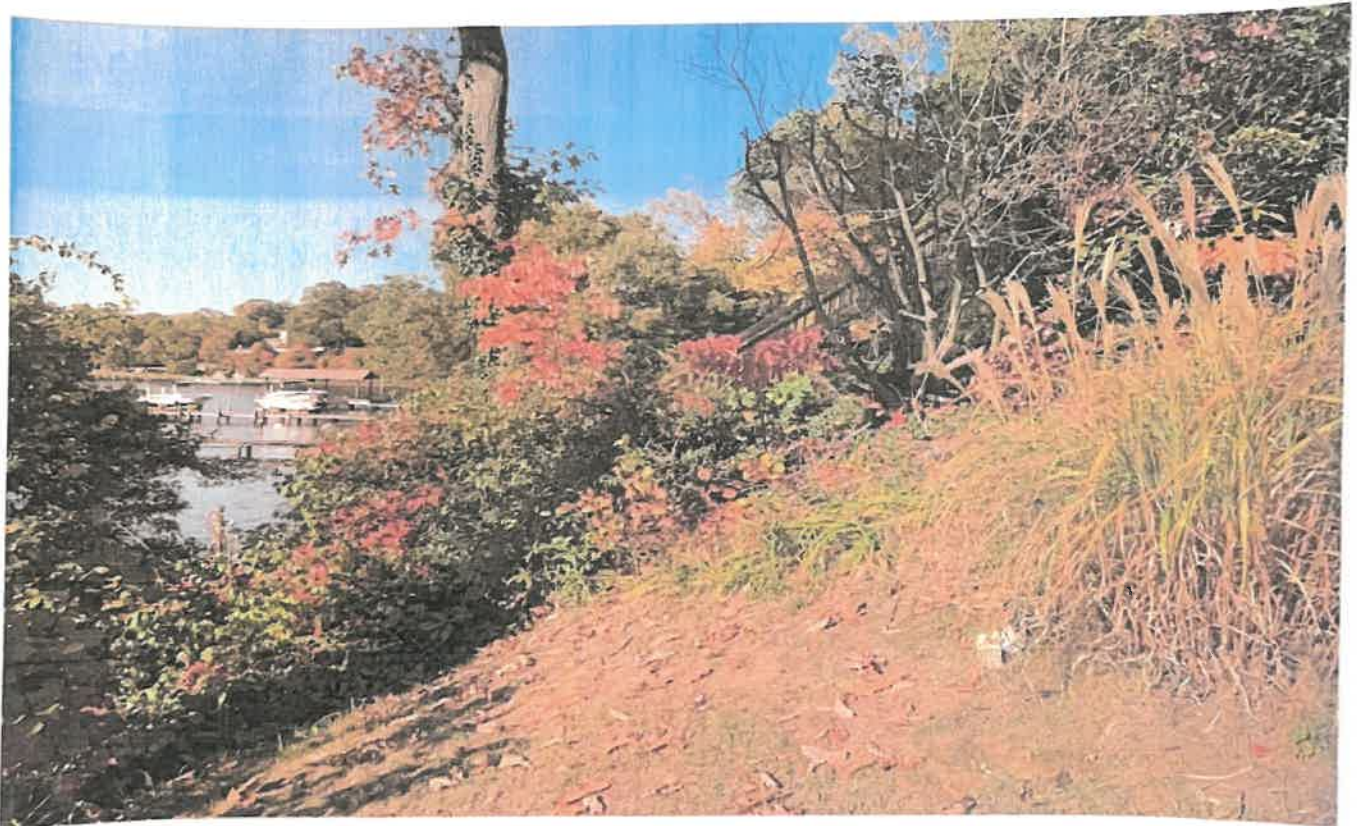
Looking North, Slopes Stable With No Erosion Or Sloughing Present
